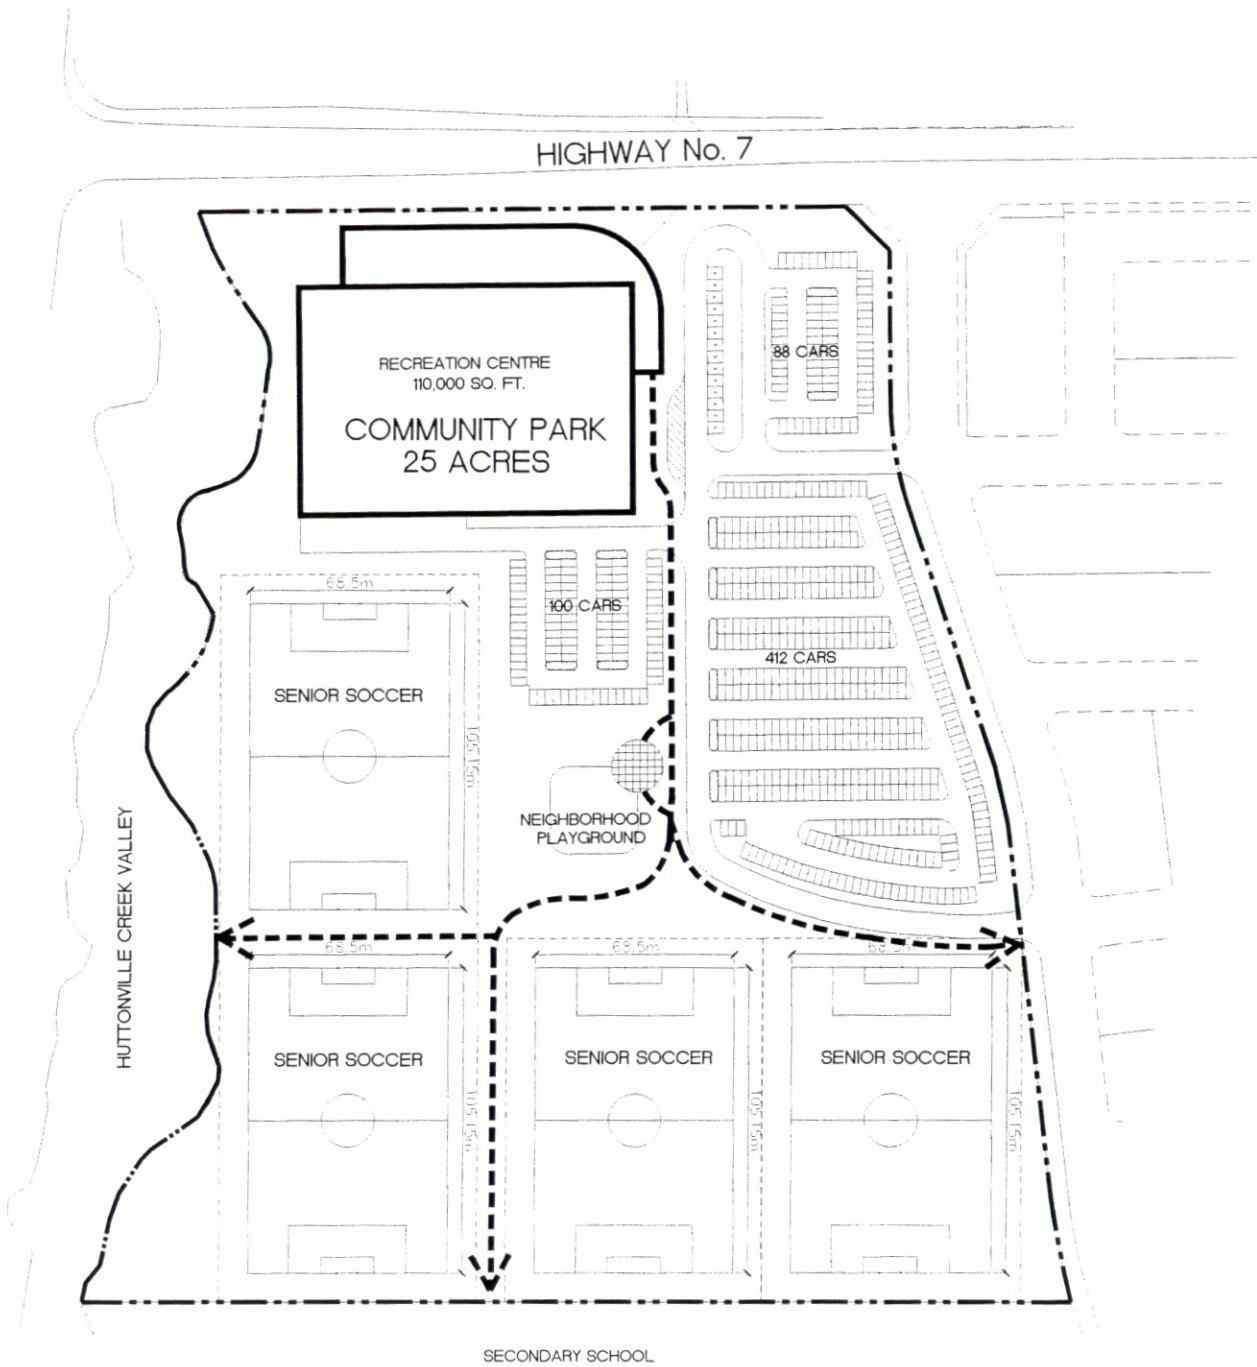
FACILITY FIT PLAN OF COMMUNITY PARK AT HWY. #7 N.T.S.
